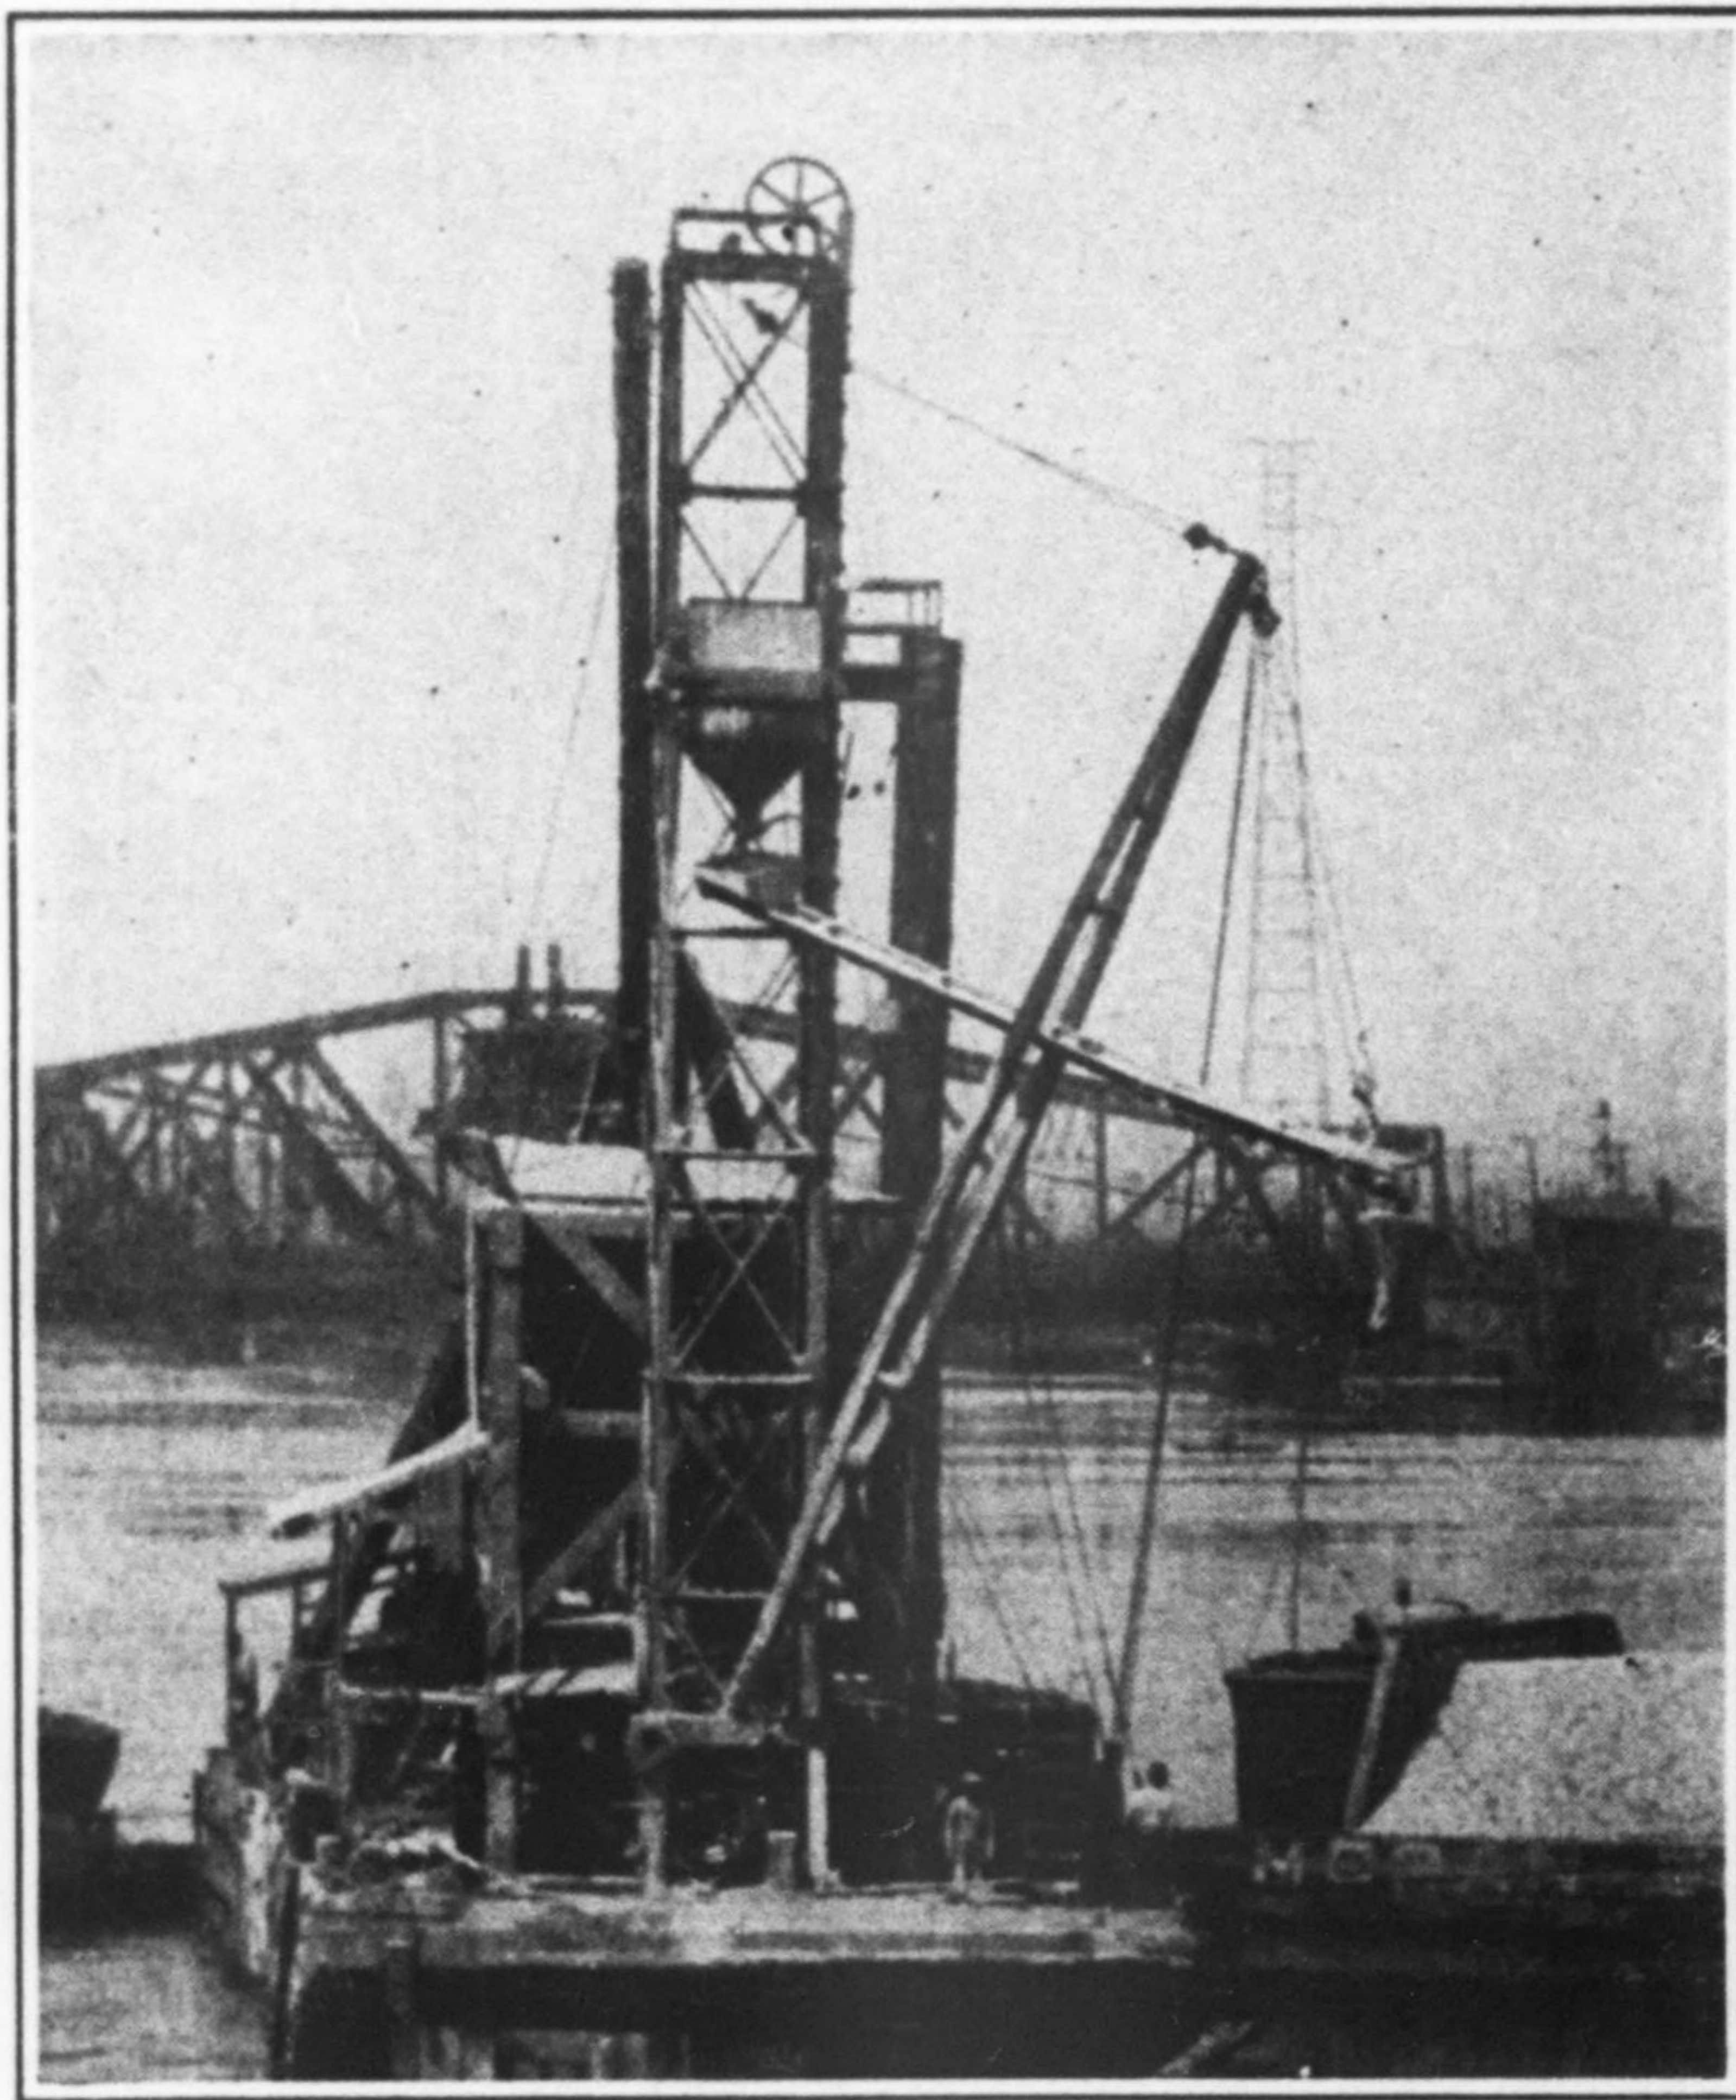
FLOATING CONCRETE PLANT USED IN POURING RIVER PIERS
